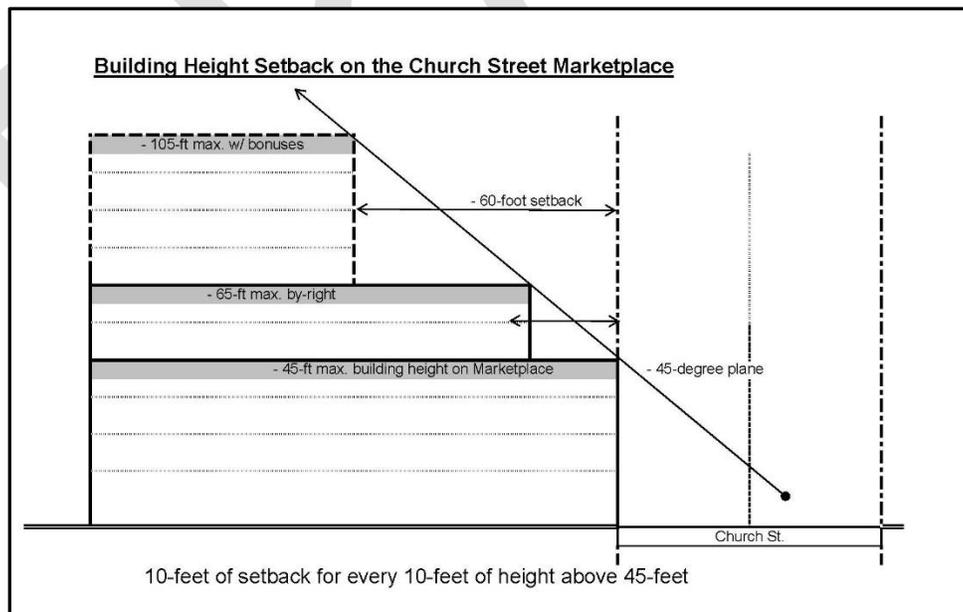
Measuring Height Limits for Church Street Buildings
